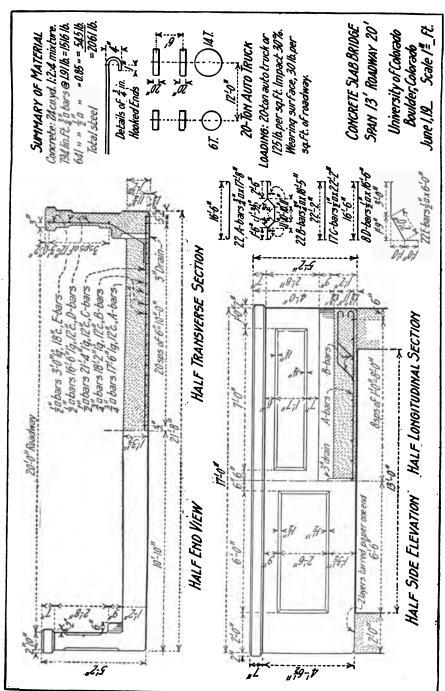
REINFORCED CONCRETE SLAB BRIDGE. DESIGNED FOR KETCHUM'S SPECIFICATIONS, D. LOADING.
